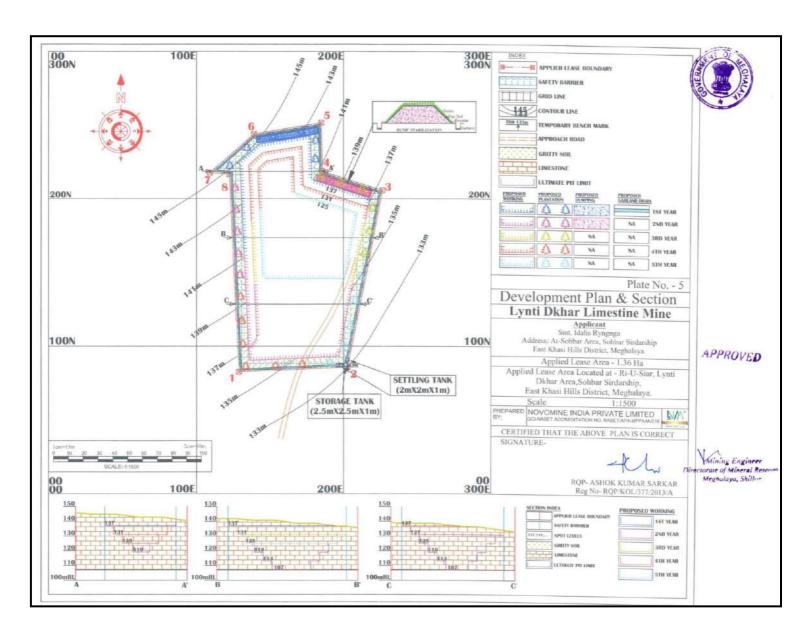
Development Plan and Section of the proposed Lynti Dkhar Limestone Mine
